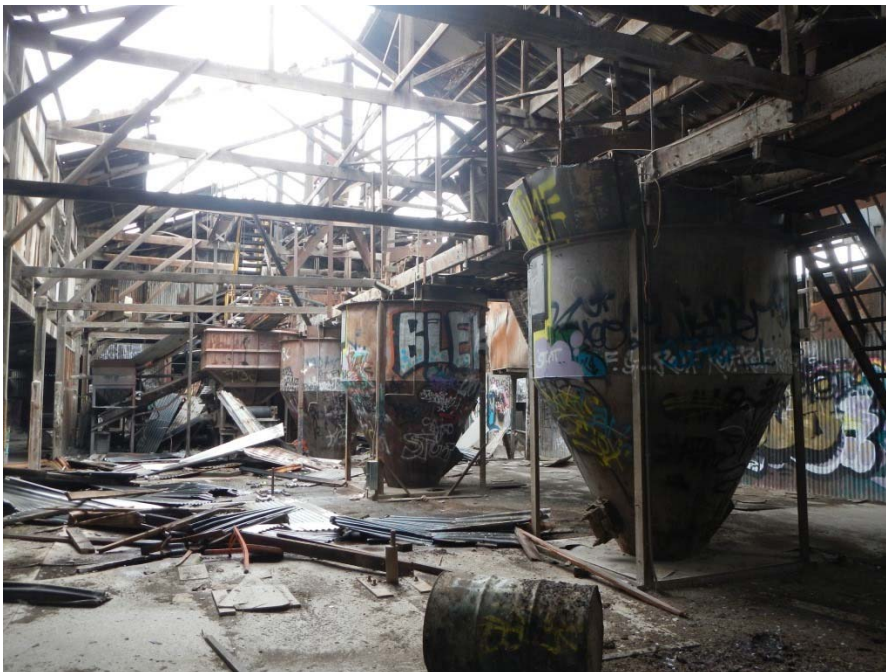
The upper level of the Brick Pressing Shed showing the damage caused by the fire in the roof.
